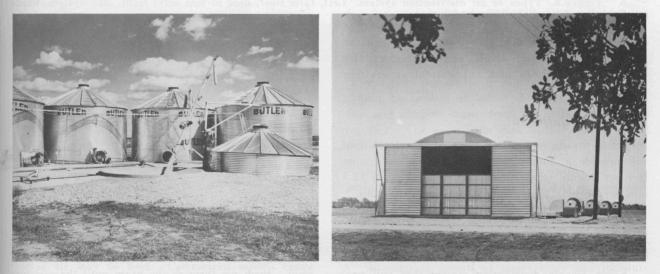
Typical grain drying building or bin installations. Handling equipment and arrangements are important in reducing labor.
